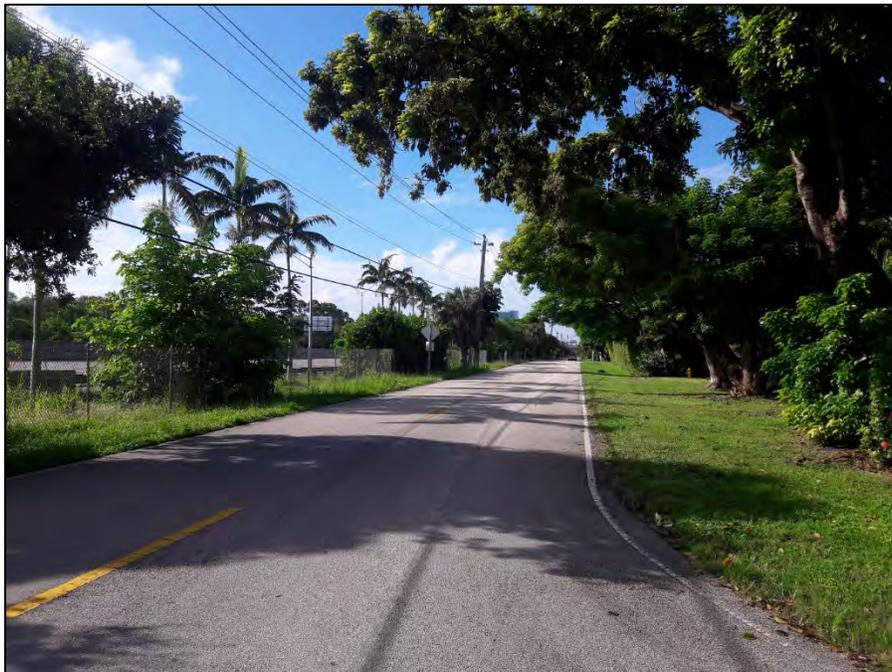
Proposed ROW East of SW 77th Avenue and South of SW 74th Court with Existing Landscaping and Fence, Facing South.
